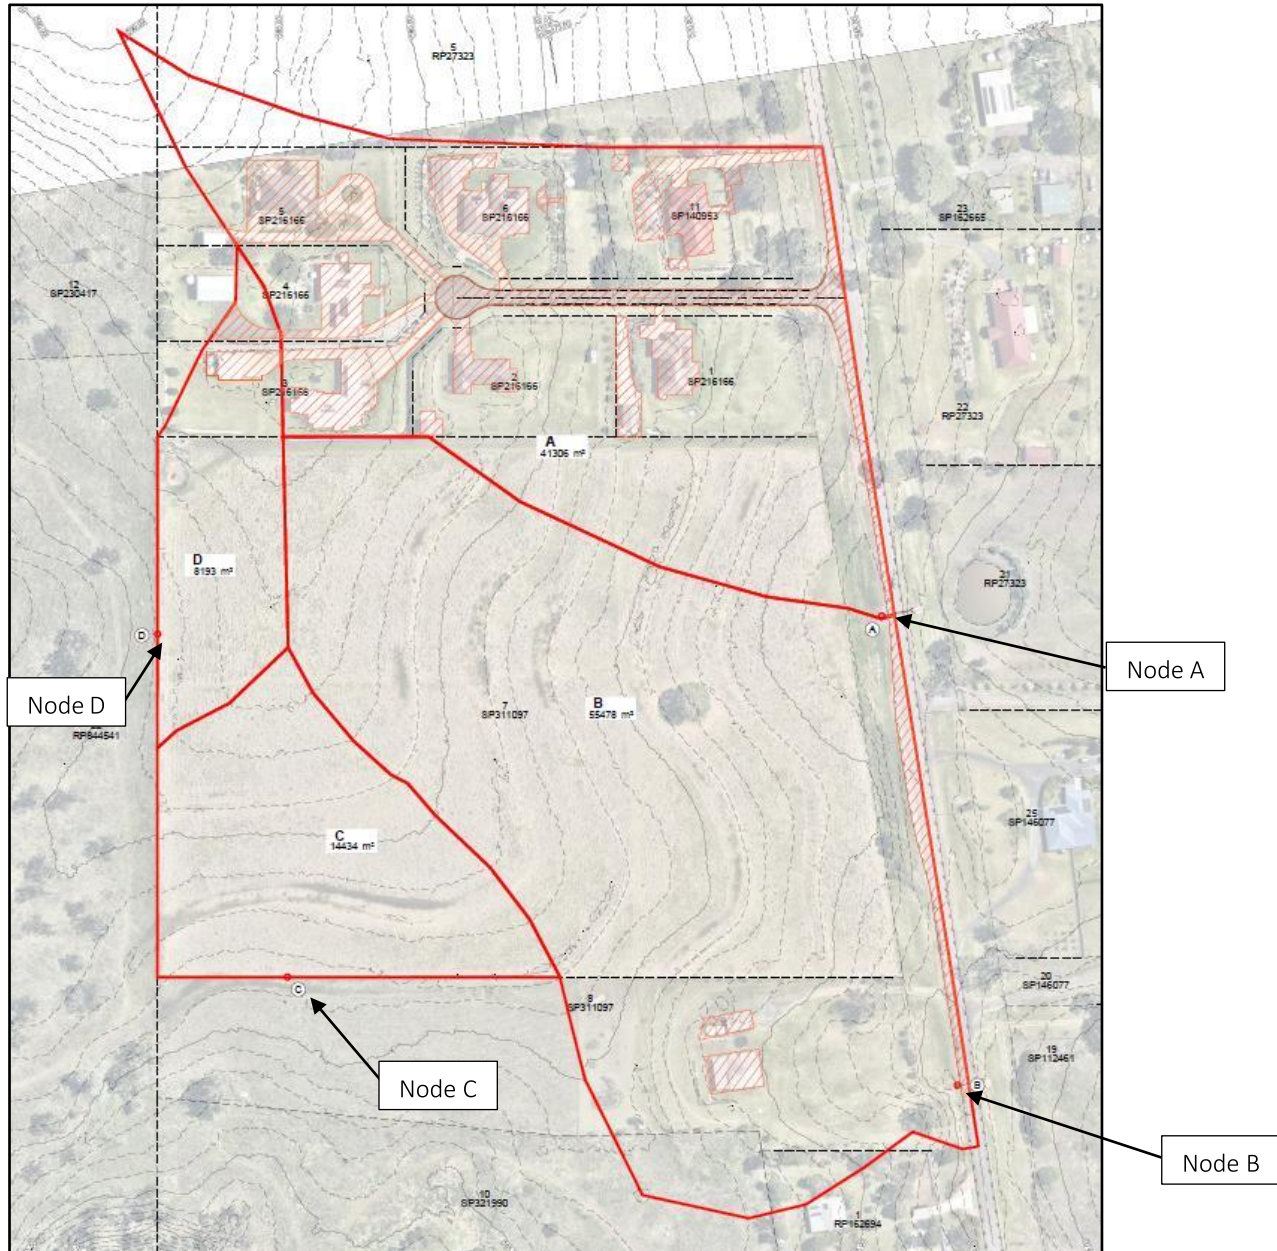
PRE-DEVELOPED STORMWATER CATCHMENT PLAN
